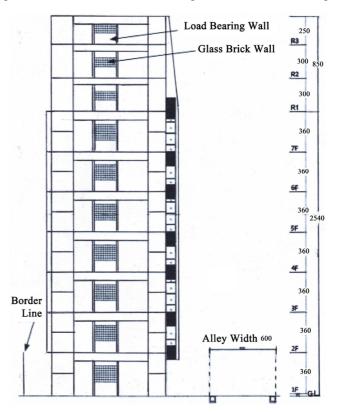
The Approved Plan of the West Side of Building B (Unit: cm).
